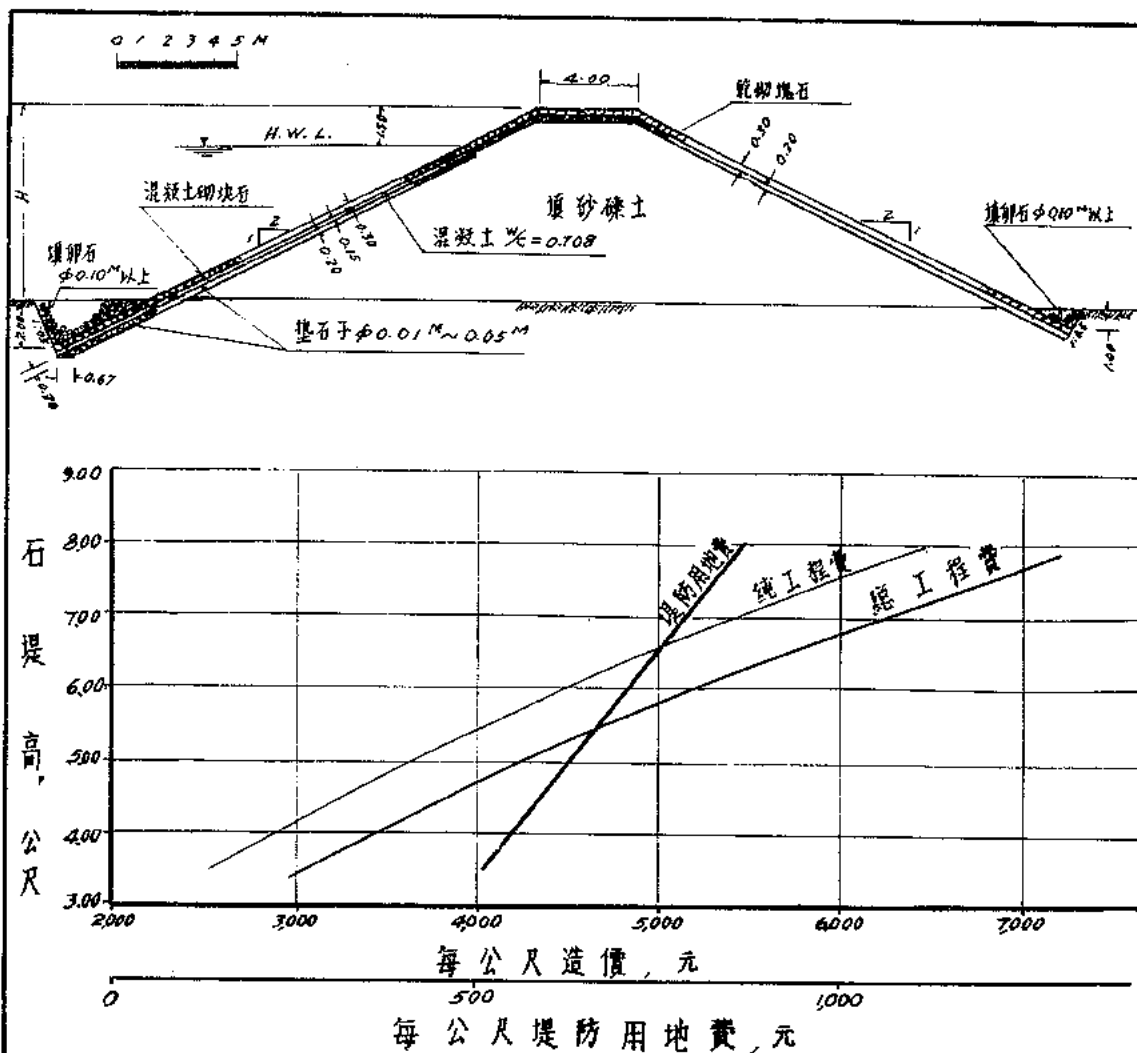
6 TYPICAL SECTION OF EARTH LEVEE
